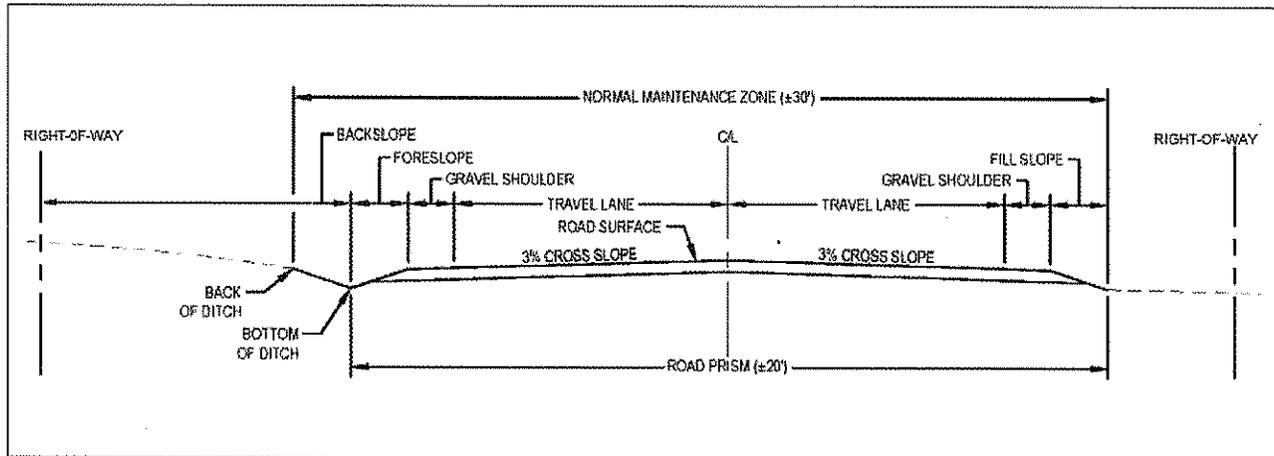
Typical Road Section for Gravel and Paved Surfaces
